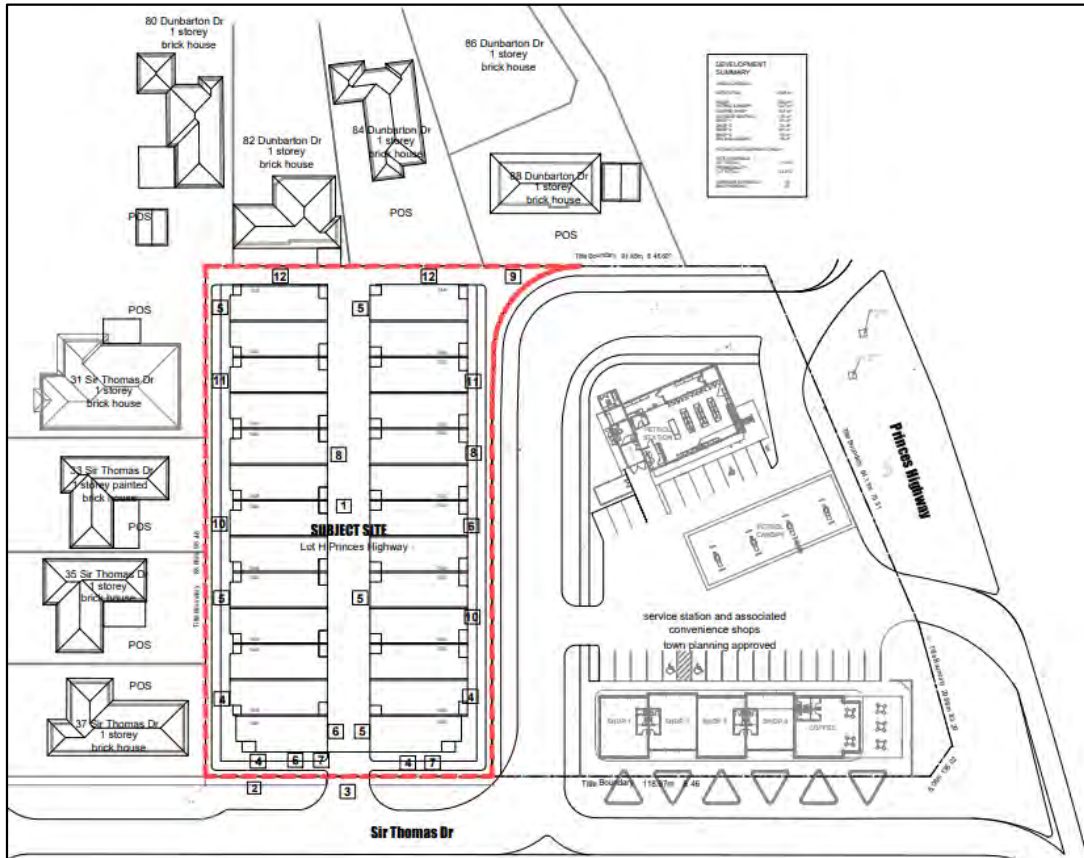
Site Plan showing the southern portion of the site in red, and the historically permitted but not constructed (and expired) service station to the north.
